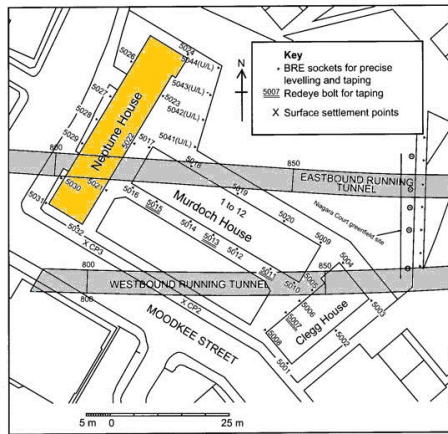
Plan of Neptune House and JLE running tunnels (after Mair and Taylor [17]).
